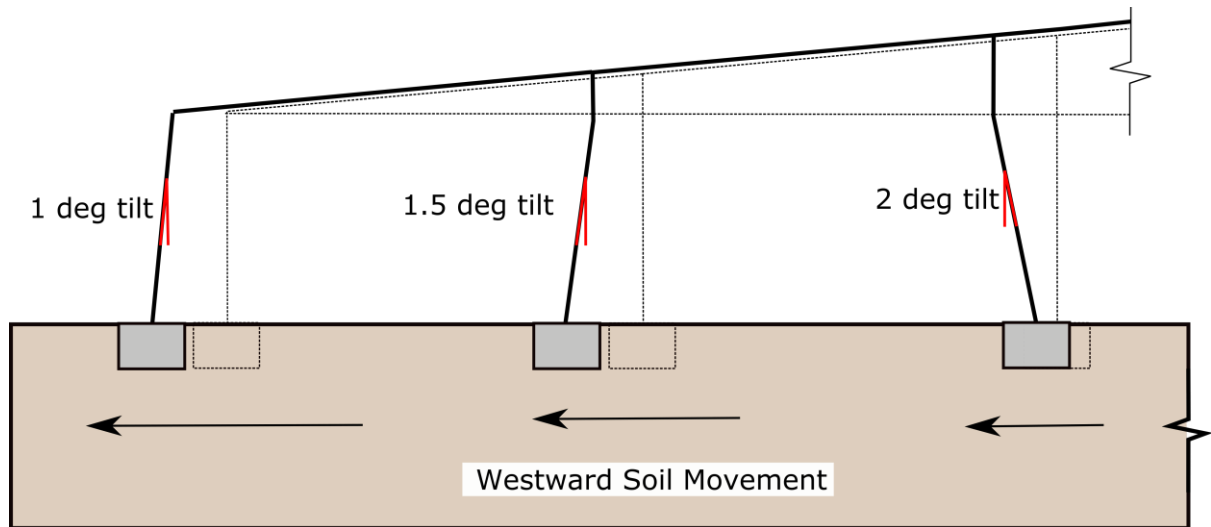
Schematic of deformation pattern of steel frame along the north wall of CS building (3 west-most columns of the Shed; looking north from interior).
